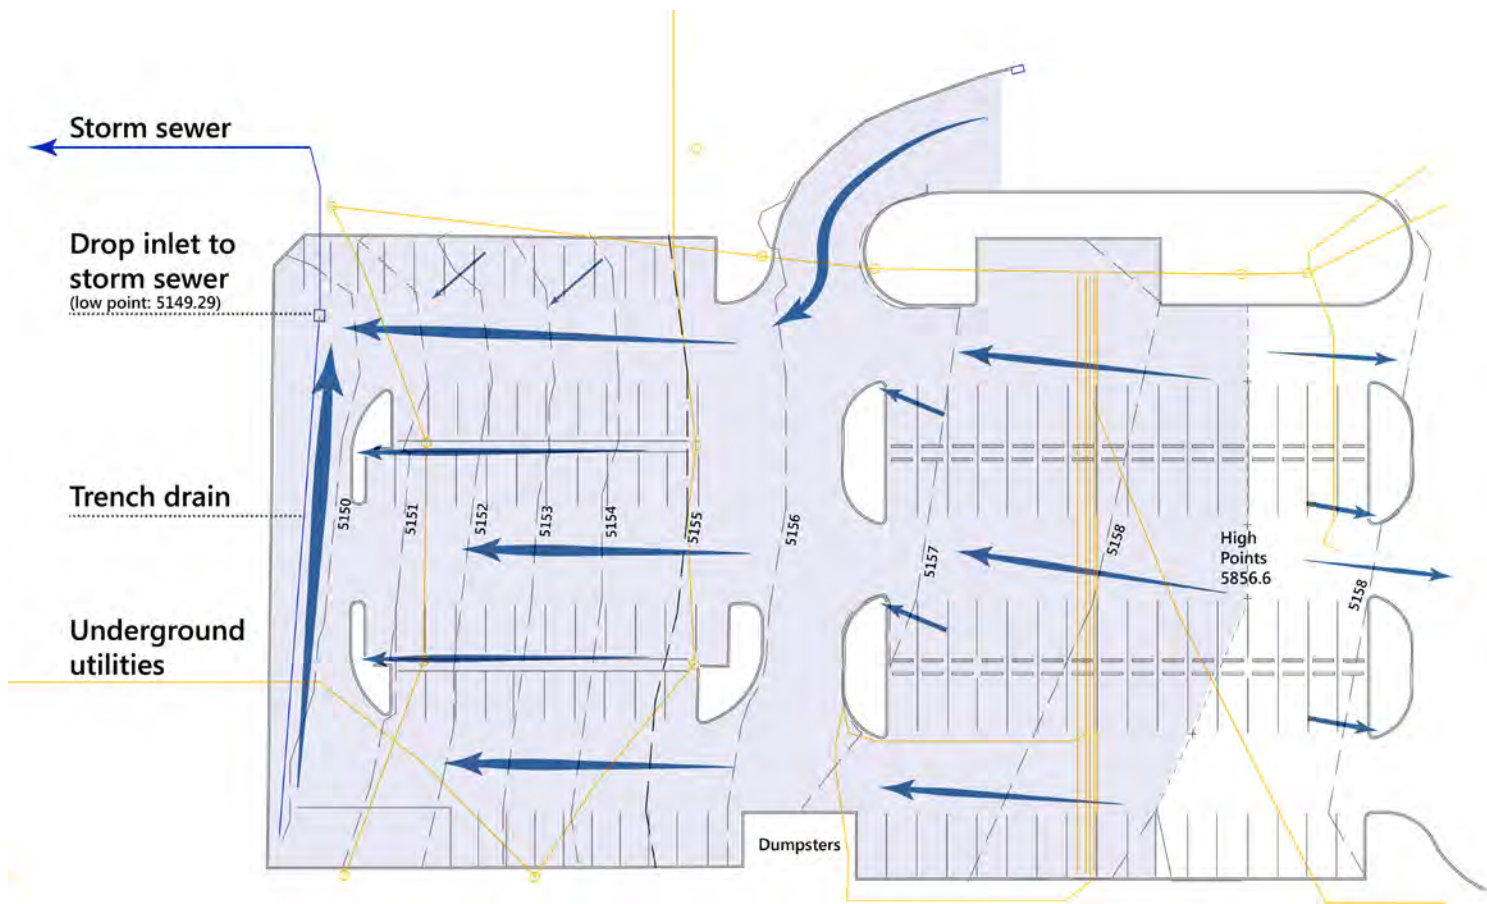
Trench Drain and Drop Inlet in Parking Lot (photo by author)
